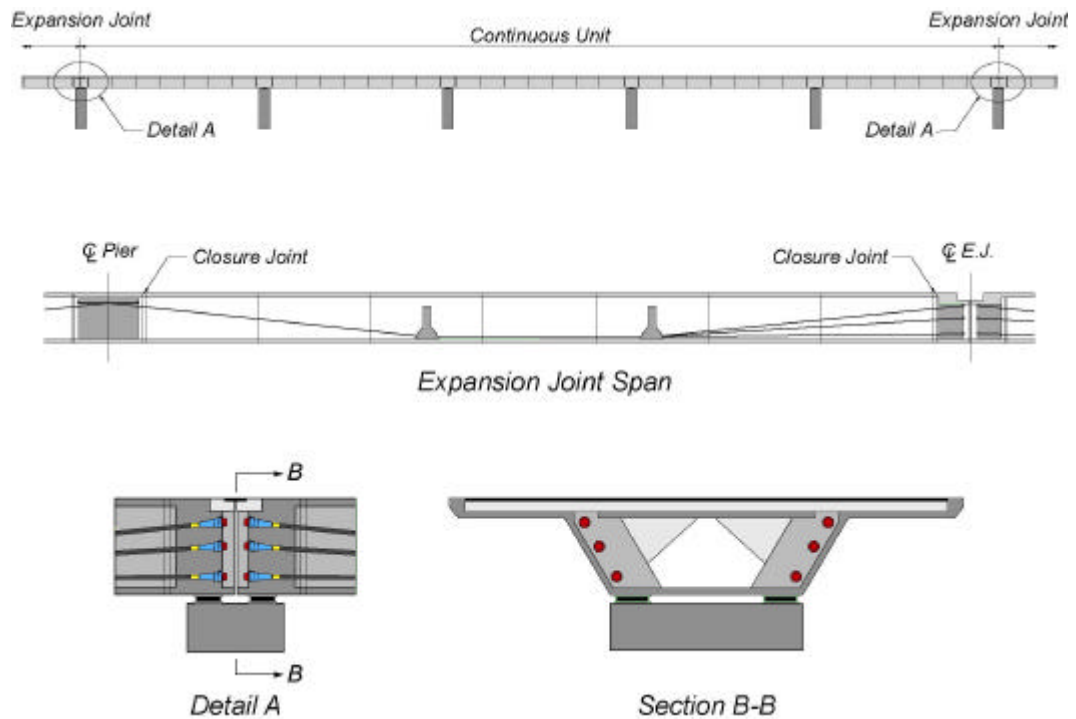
Expansion Joint Span Post-Tensioning for Span-By-Span Construction
